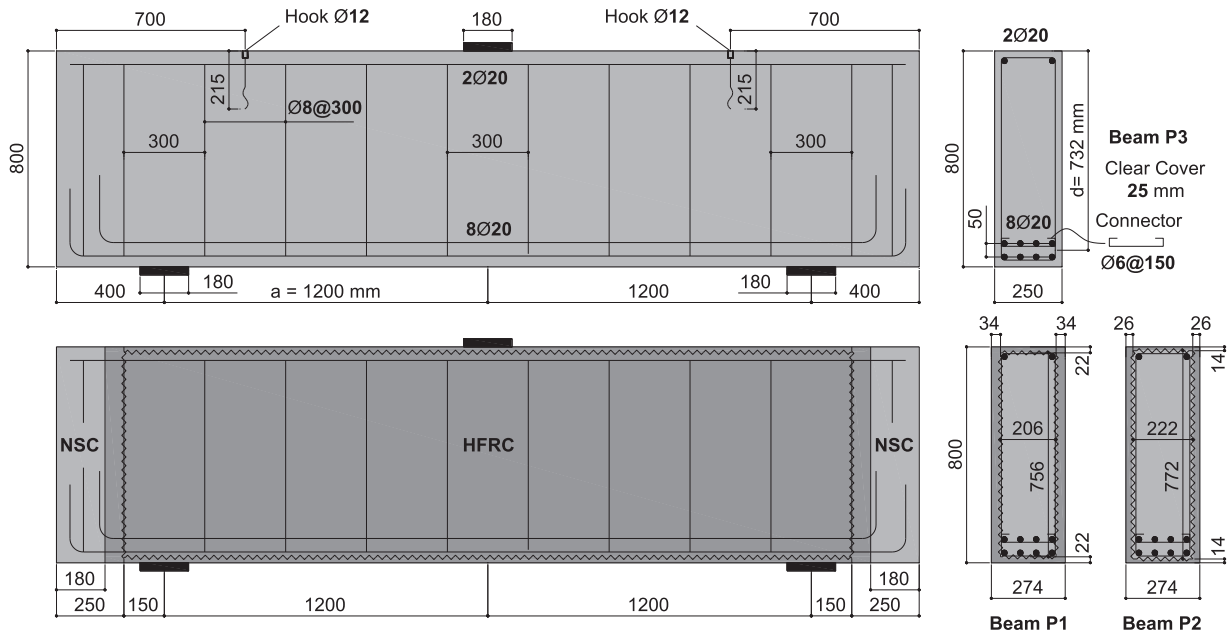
Geometrical properties and reinforcement details of test specimens.
